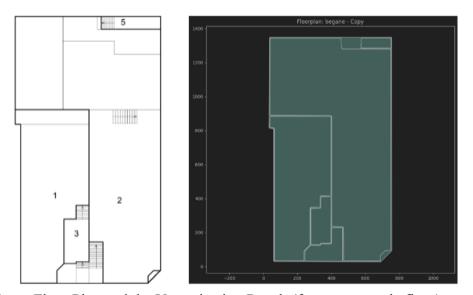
Input Floor Plan and the Vectorization Result (for one example floor)
